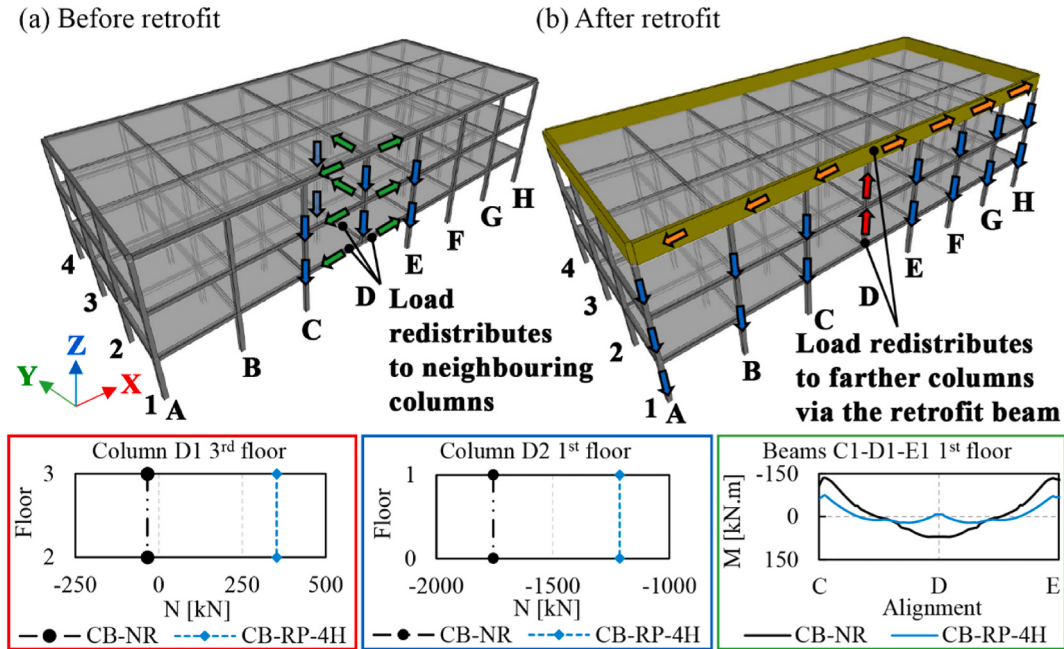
Sketch of the building's response to the failure of an exterior column at the centre of the long side: (a) Non-retrofitted building (CB-NR); (b) Building with retrofit beams at the roof perimeter (CB-RP-4H).
